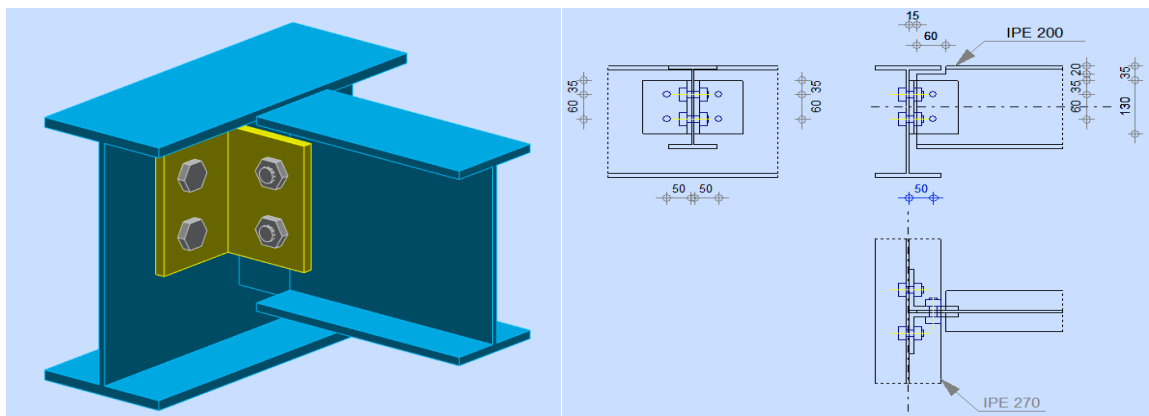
Beam IPE270-Joist IPE200 connection.
